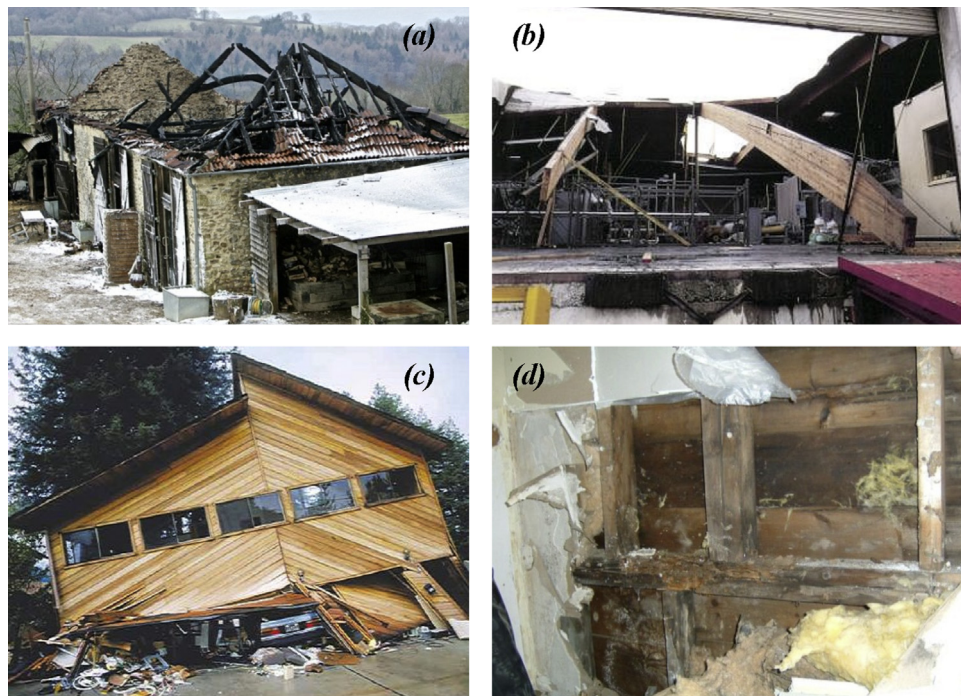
Examples of Potential Damages of Wood Structures: (a) Fire Damage, (b) Inaccurate Connection Details and Design Faults, (c) Seismic Capacity Deficiency, (d) Environmental Deterioration.
